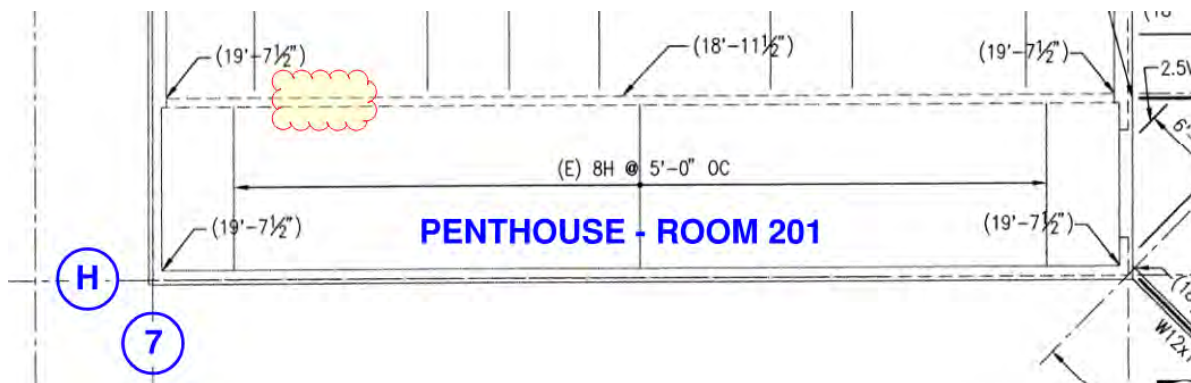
Southern penthouse, room 201. Observed damage (Figure 23) in CMU wall is clouded.
